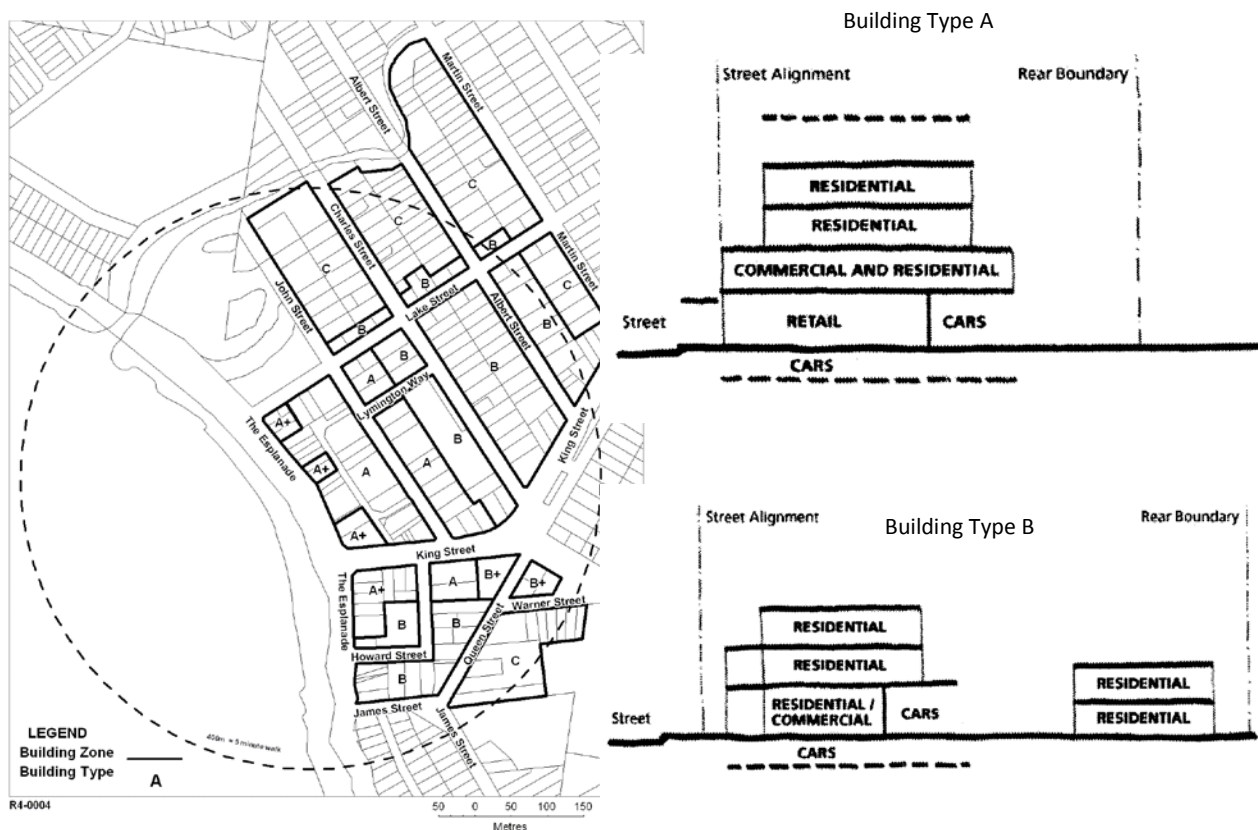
Heights of Buildings DCP No.1 - Warners Bay Area Plan
